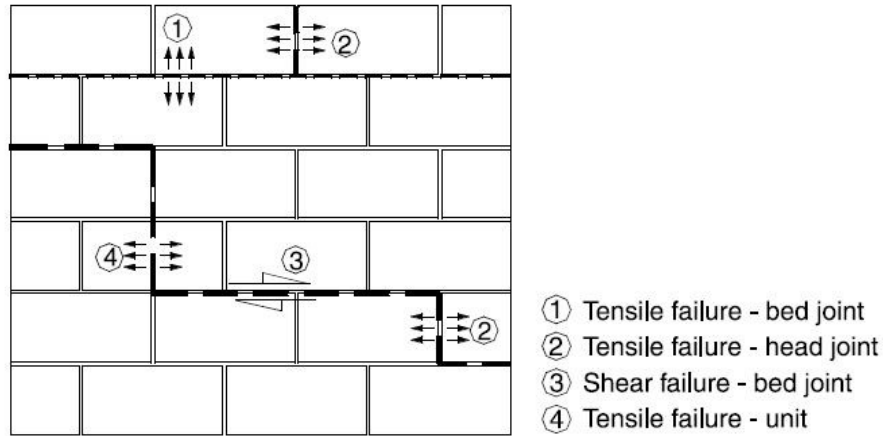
Failure modes in the masonry infill wall (Source: Dawe et al., 2001a)
